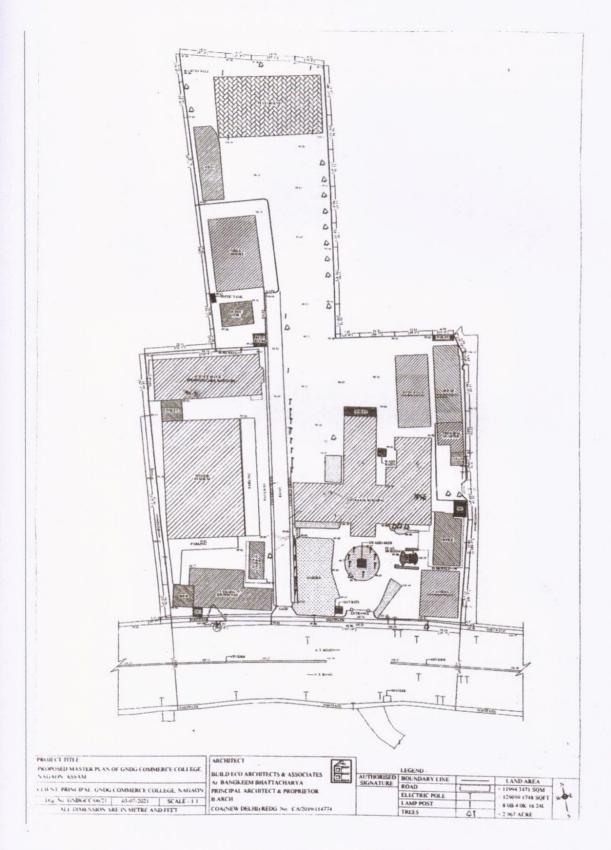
Proposed master plan of Nagaon GNDG Commerce College
